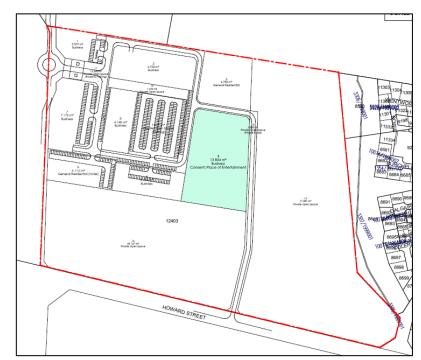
PROPOSED BUSINESS ZONE WITH CONSENT USE FOR A PLACE OF ENTERTAINMENT ERF
